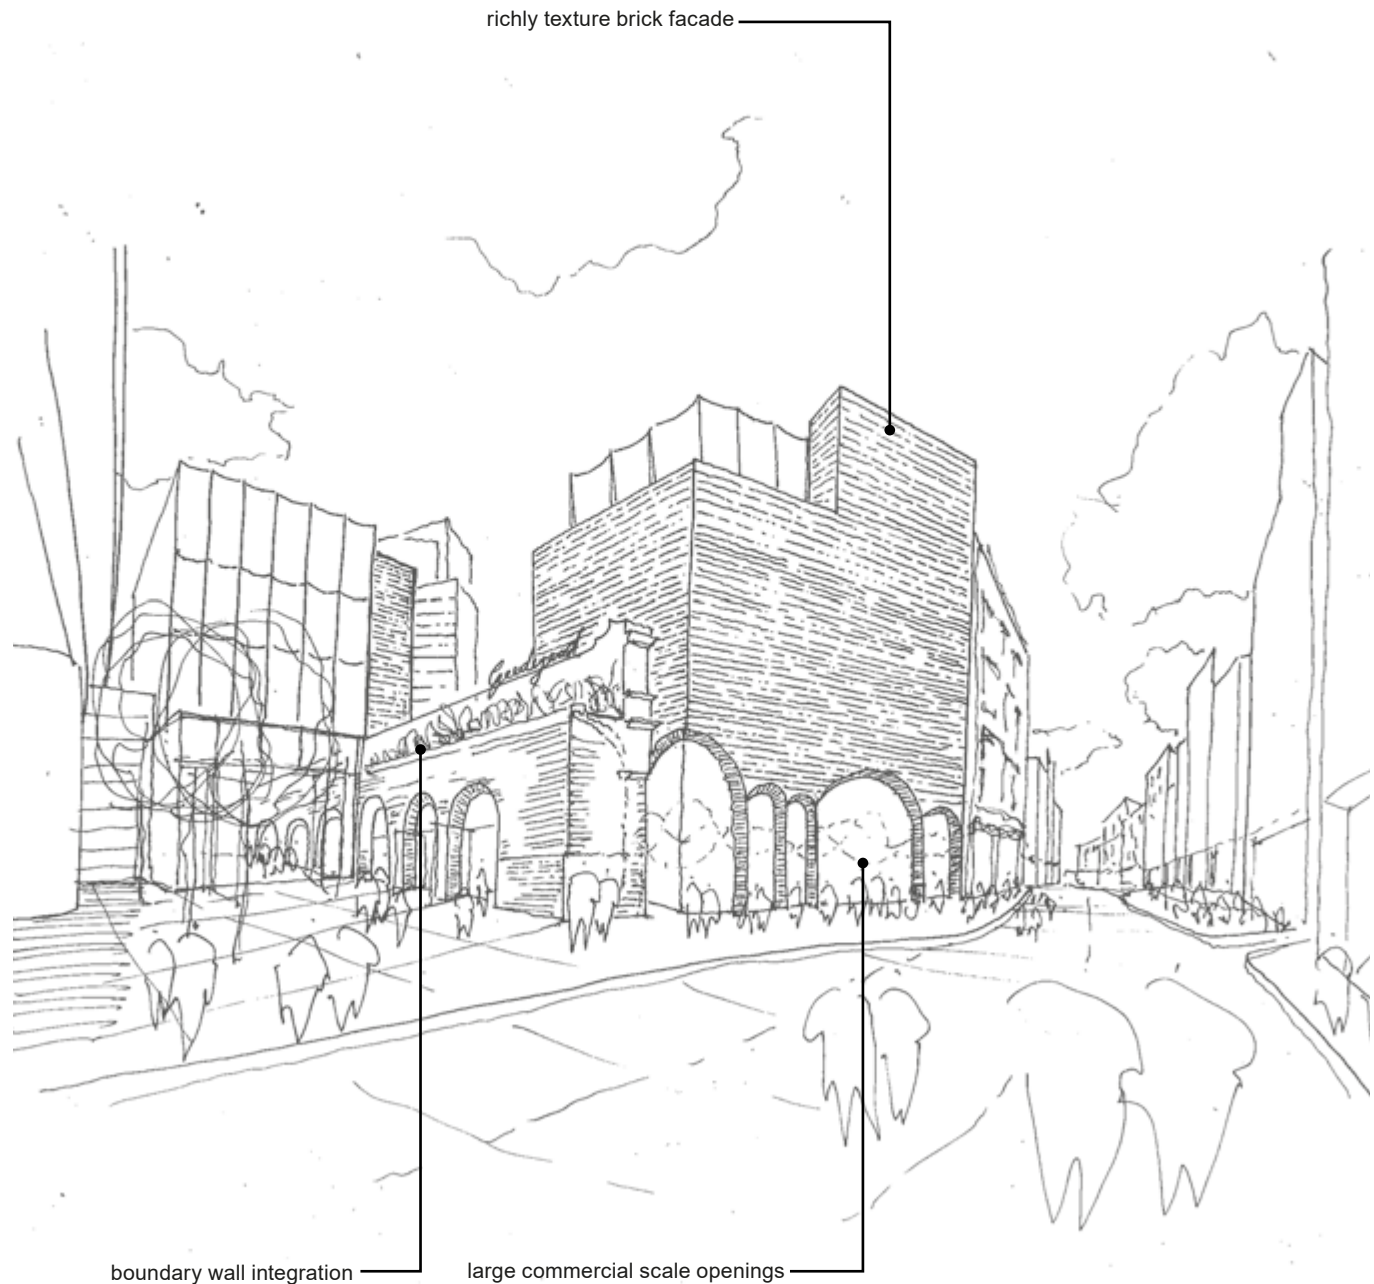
Artists impression of east facade , facing Brick Lane
